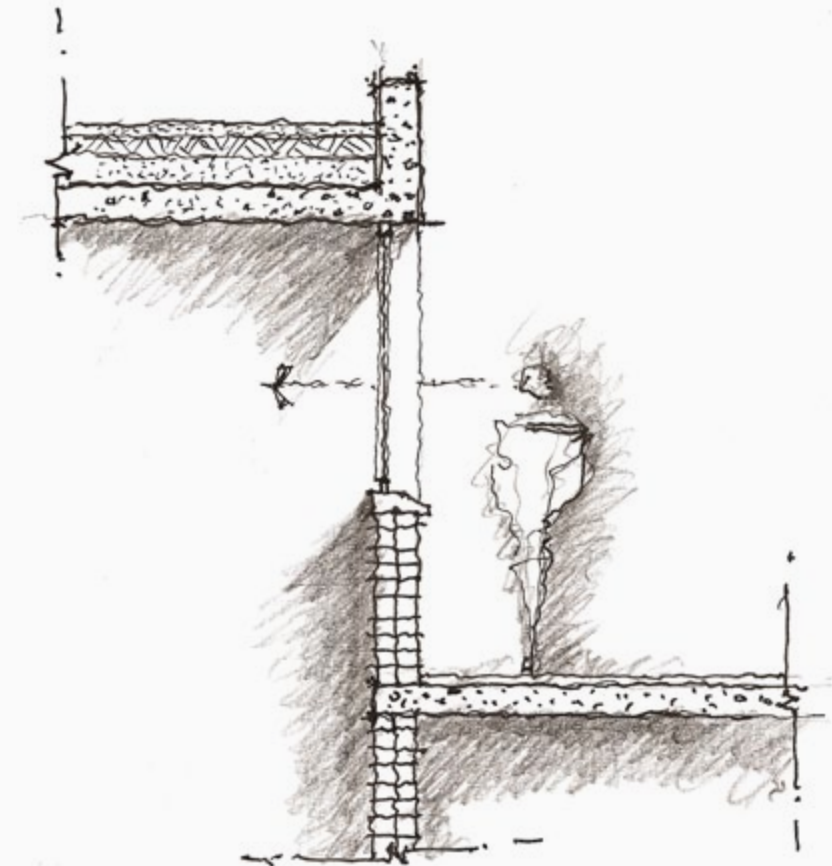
Detail of the viewing platform into the milk processing area below ground (Author: 2012)
